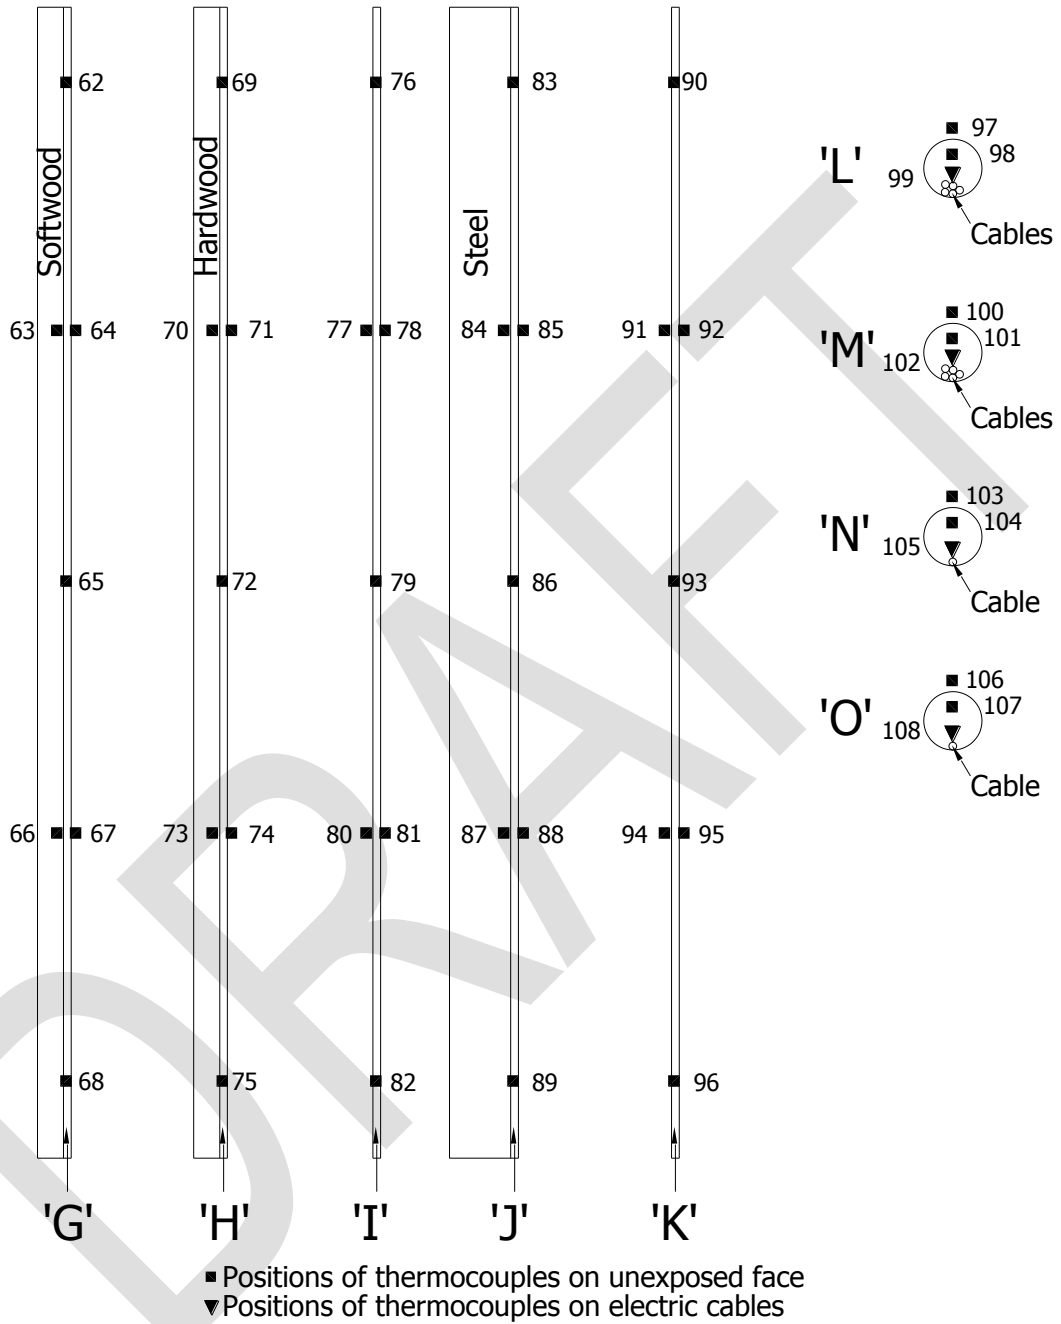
General elevation of the Unexposed Face of the Wall Test Specimens
